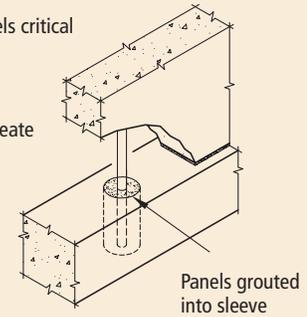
Bearing wall to foundation (BWF4).
